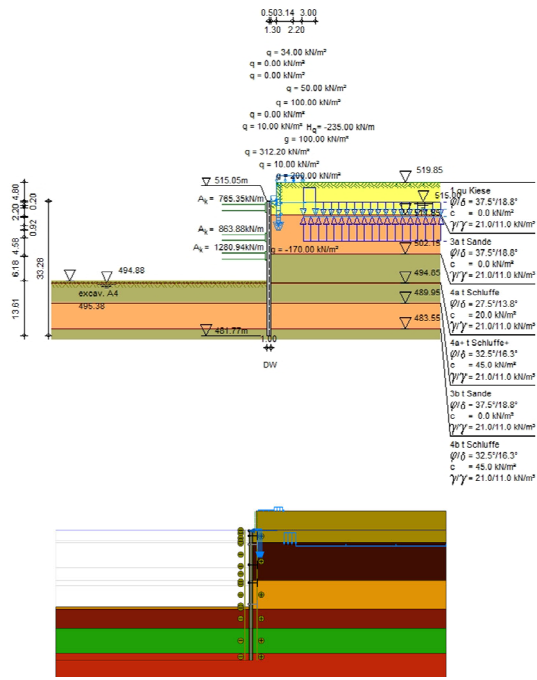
DC-Pit and Plaxis 2D model for Diaphragm wall case.
